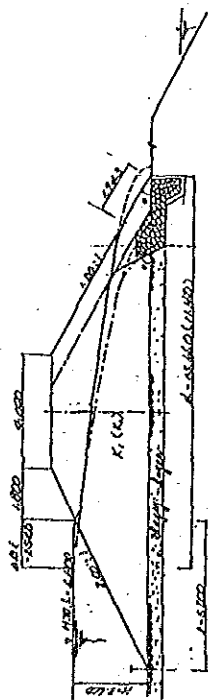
SEEPAGE LINE IN THE EMBANKMENT (With Core Wall)
